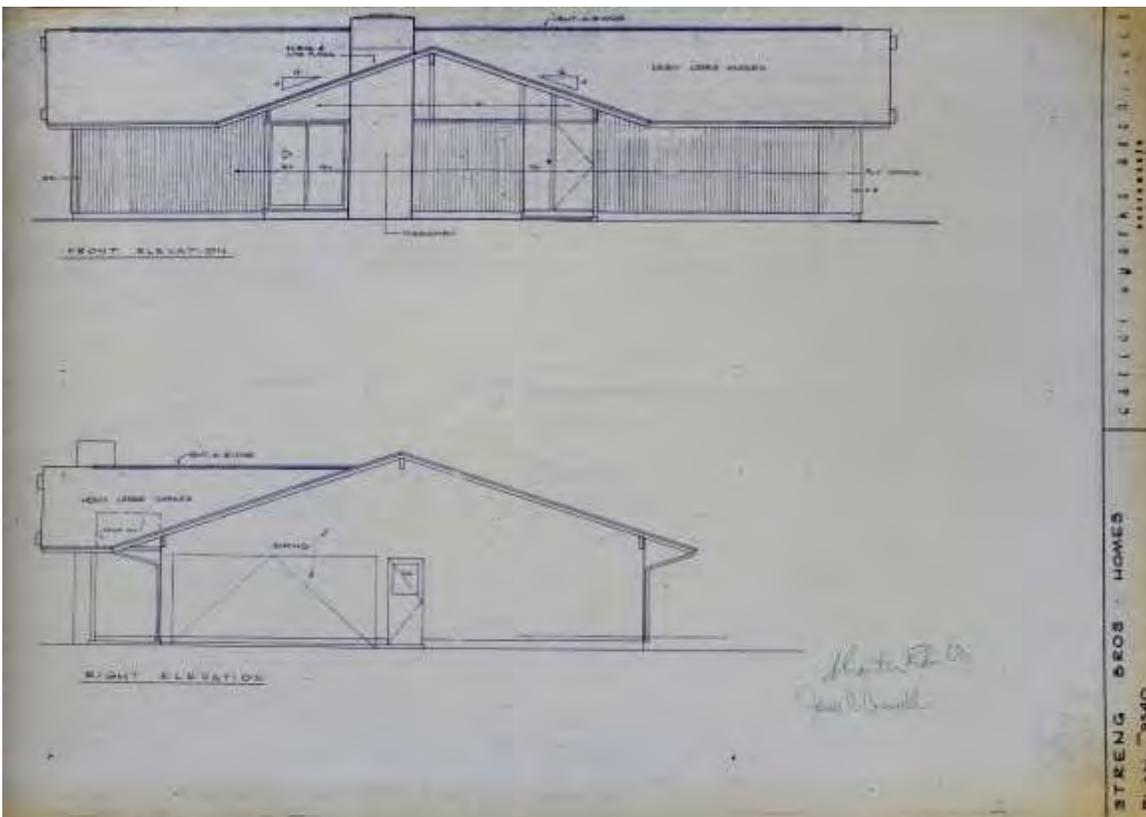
Carter Sparks architectural drawing for "transitional" plan with double garage and shake roof, undated.
